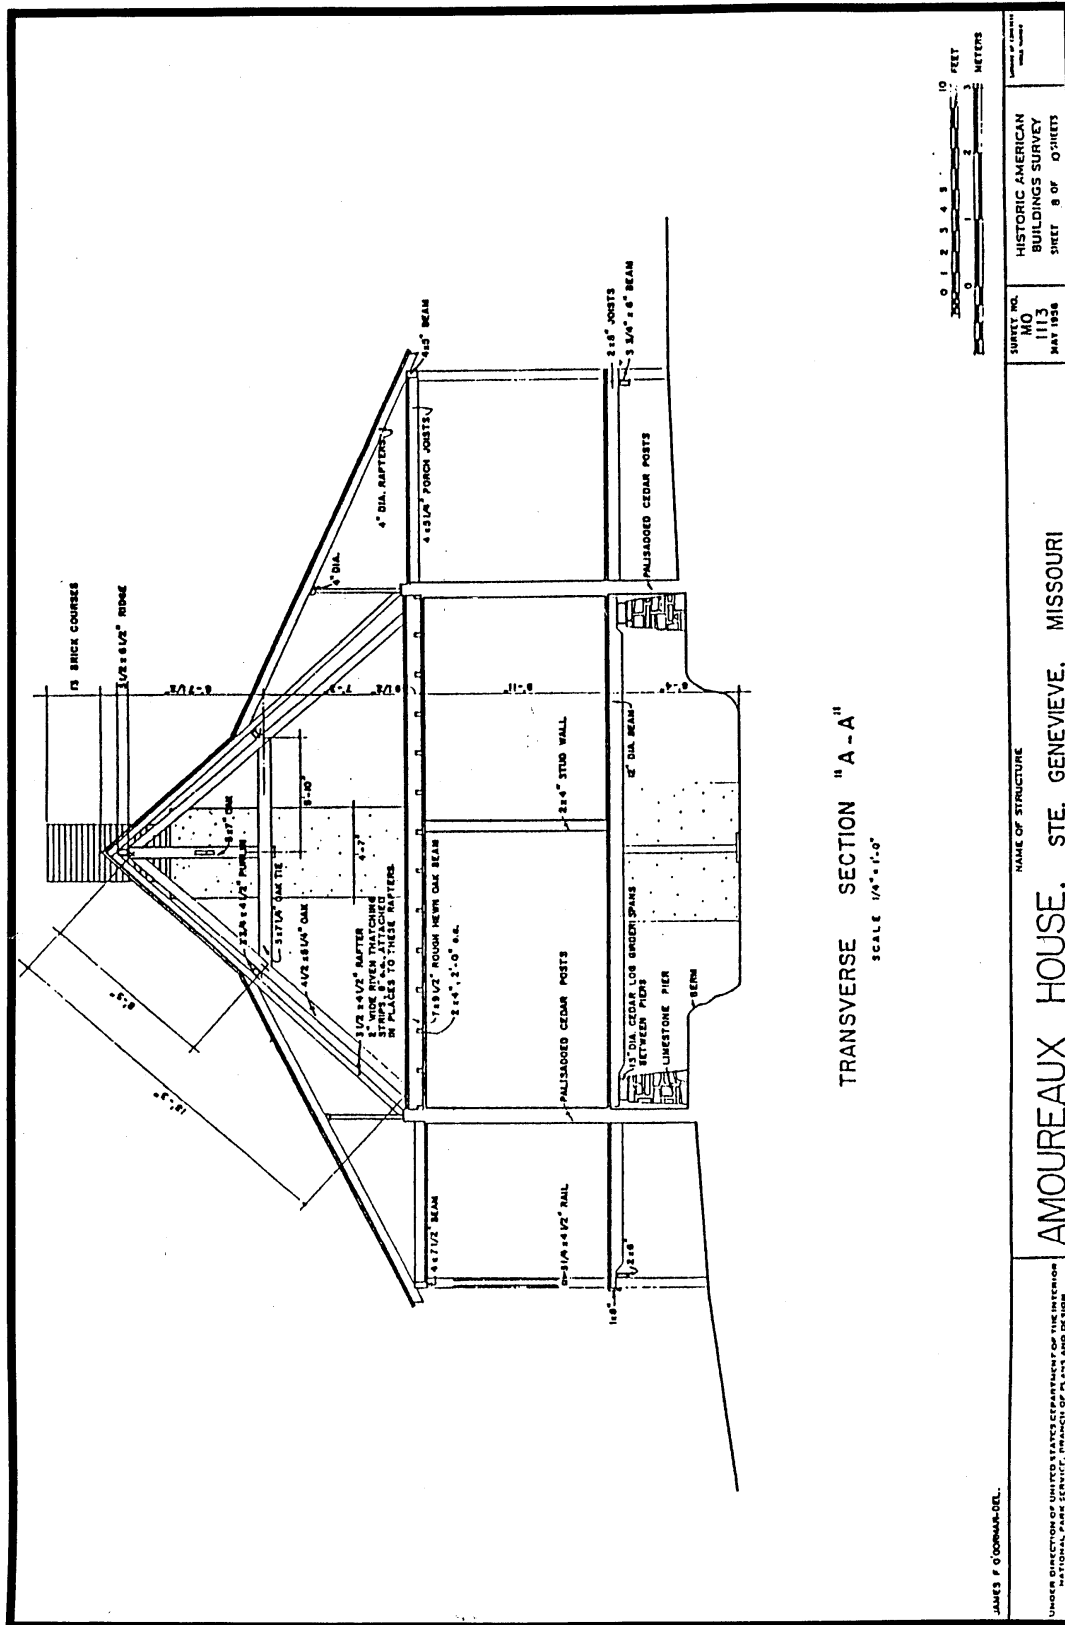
Transverse view of the Amoureux House, Ste. Genevieve Missouri, showing the limestone piers used to support the independent flooring (United States Department of the Interior, National Park Service, Historic American Buildings Survey, Survey no. MO1113).
